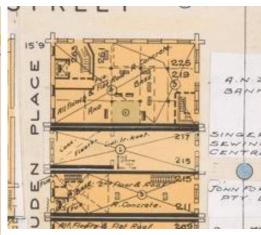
The 1948 Mahlstedt fire survey plan (amended in a later date), showing the shops at 215-217 Swanston Street extended to the western allotment boundary (Source: Mahlstedt Map section 1, no 10, 1948)
